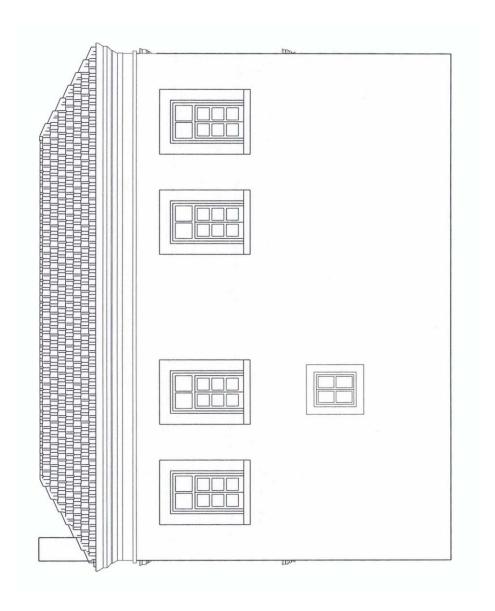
Rear Elevation of 11-Hamam Street Scale: 1/75
